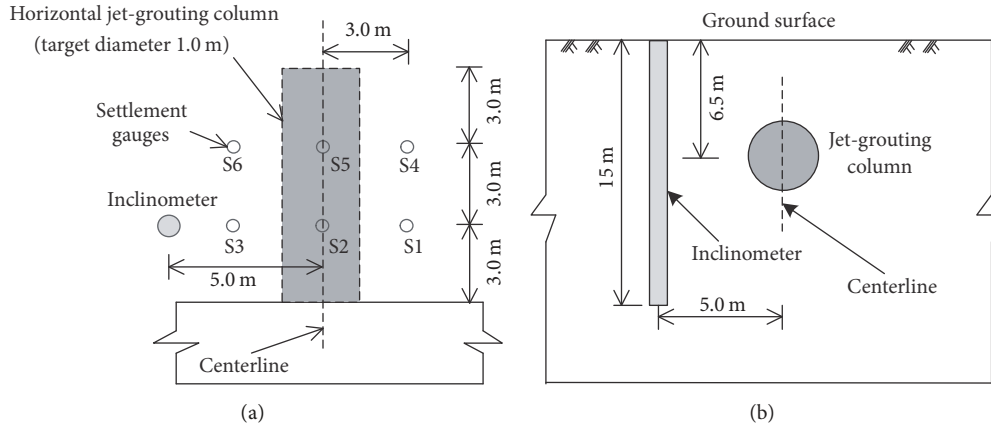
Plan and sectional view of the layout of ground settlement gauges and inclinometer (single column installation case).
